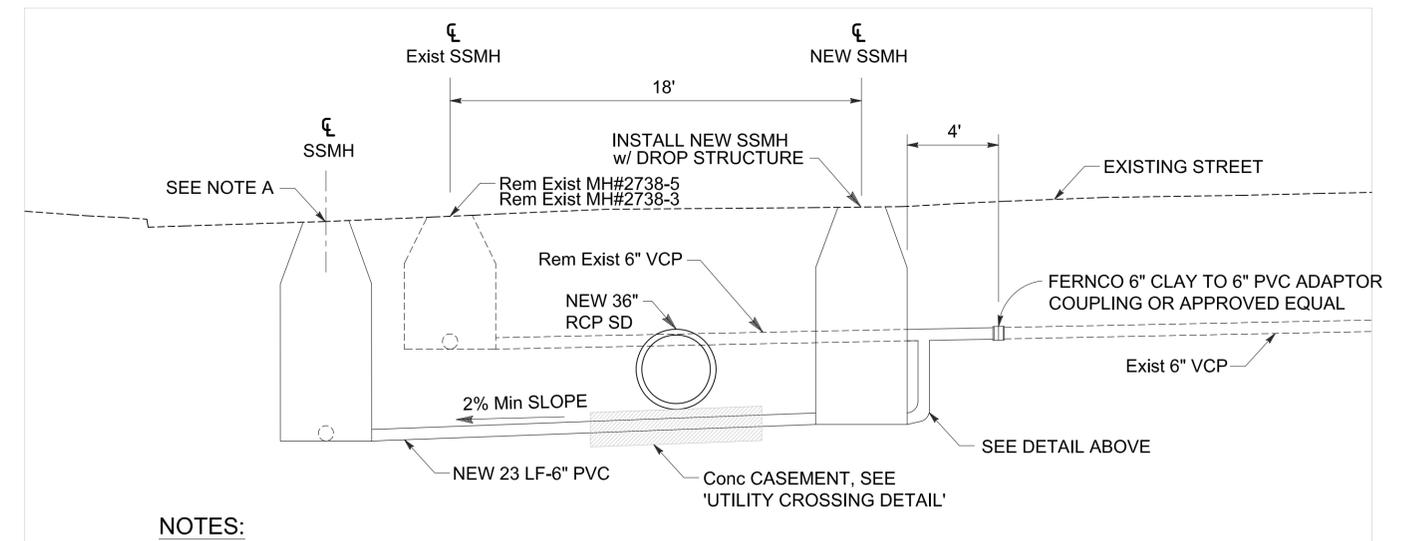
DETAIL B - SS LATERAL CONNECTION TO Exist 8" SS MAIN
